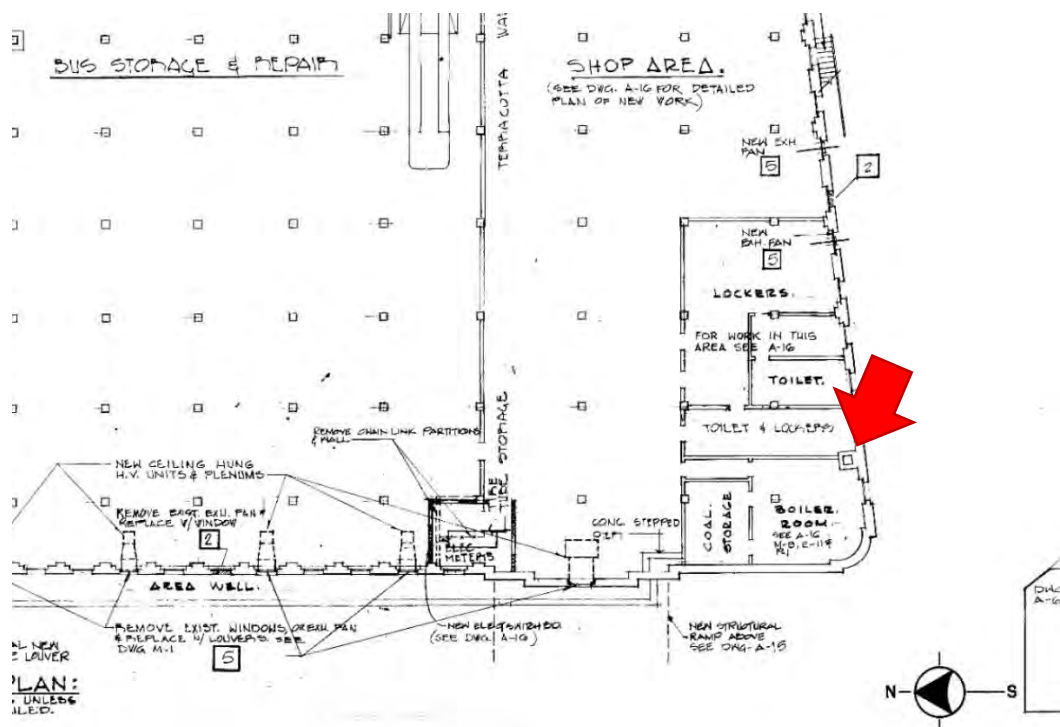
Angled brick wall on right constructed sometime after 1914 and prior to 1978. The wall created an additional interior room and enclosed the north elevation of the tower at that level. The other angled wall with the overhanging door was added after 1978 (BBB)
